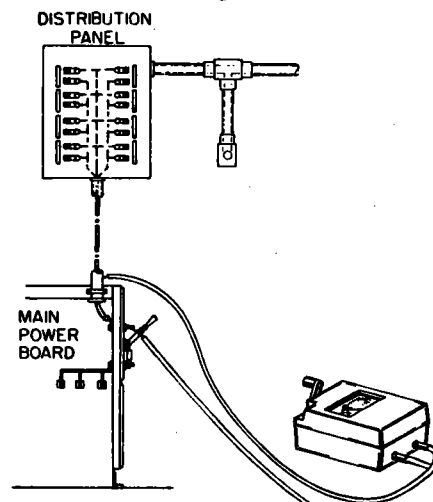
Wiring Installation, Main Power Board Test Connections
